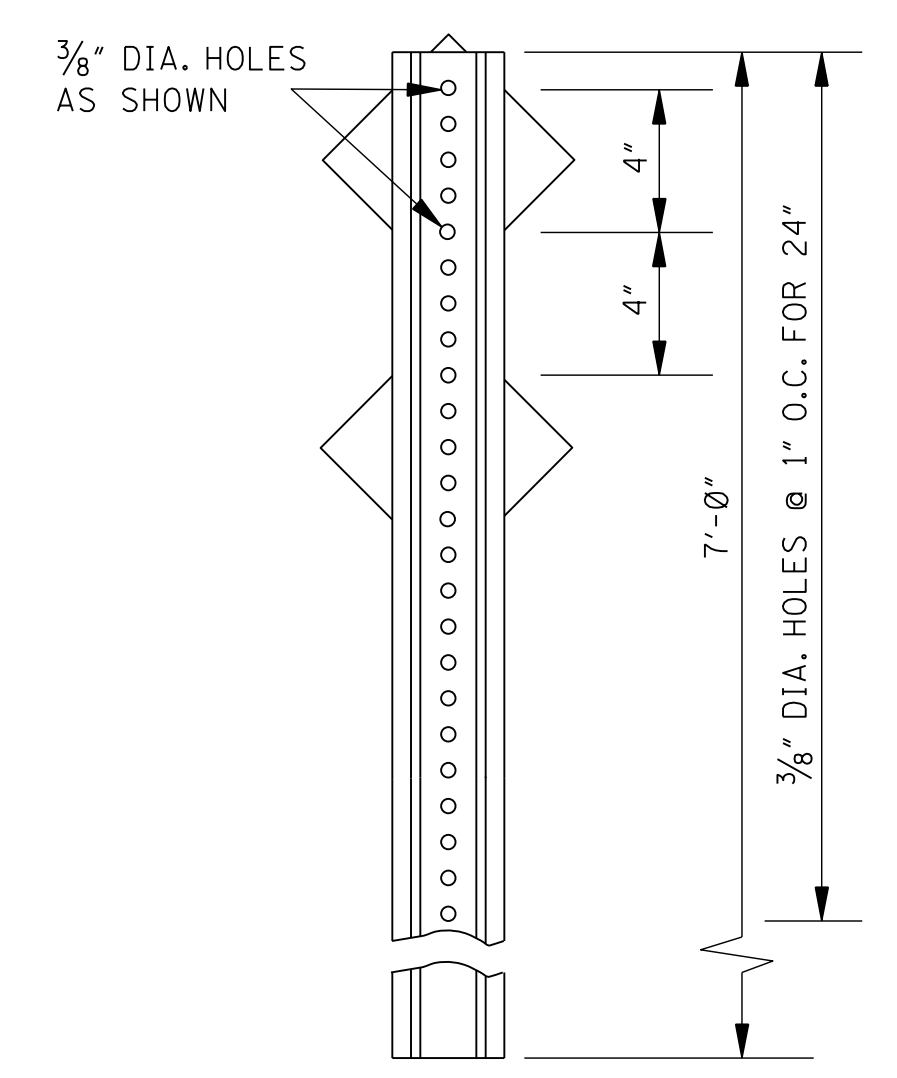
OBJECT MARKER INSTALLATION
